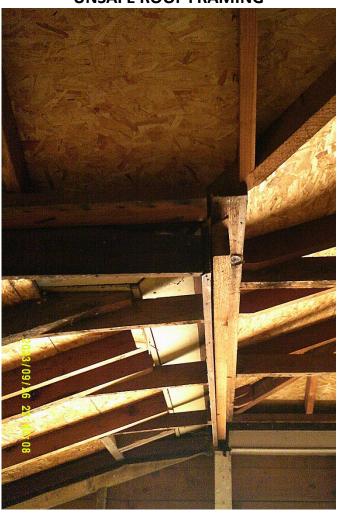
EXHIBIT "Q" – EXISTING INTERIOR AREAS TO BE DEMOLISHED
